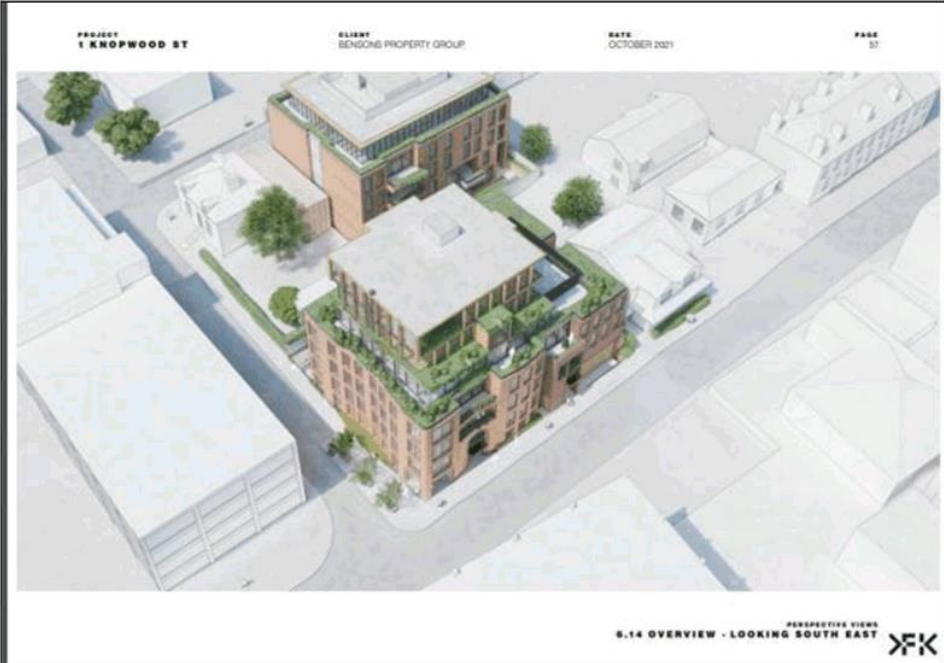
above: aerial view from Montpelier Retreat/Knopwood Street (north west building).
